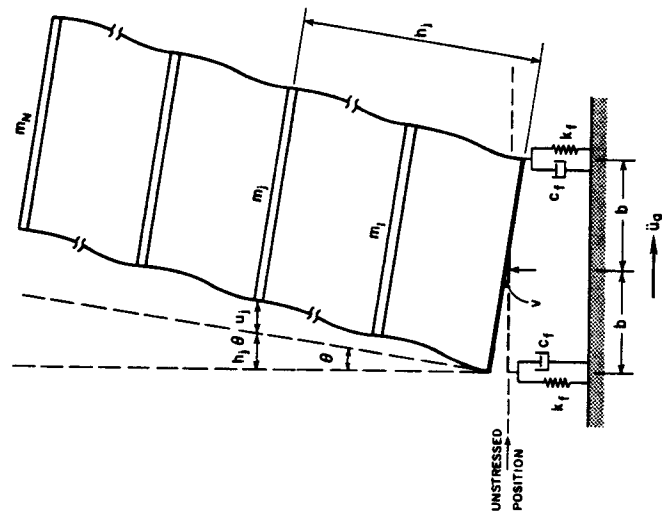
Multistory Structure Supported on Two Spring-Damper Element Foundation
